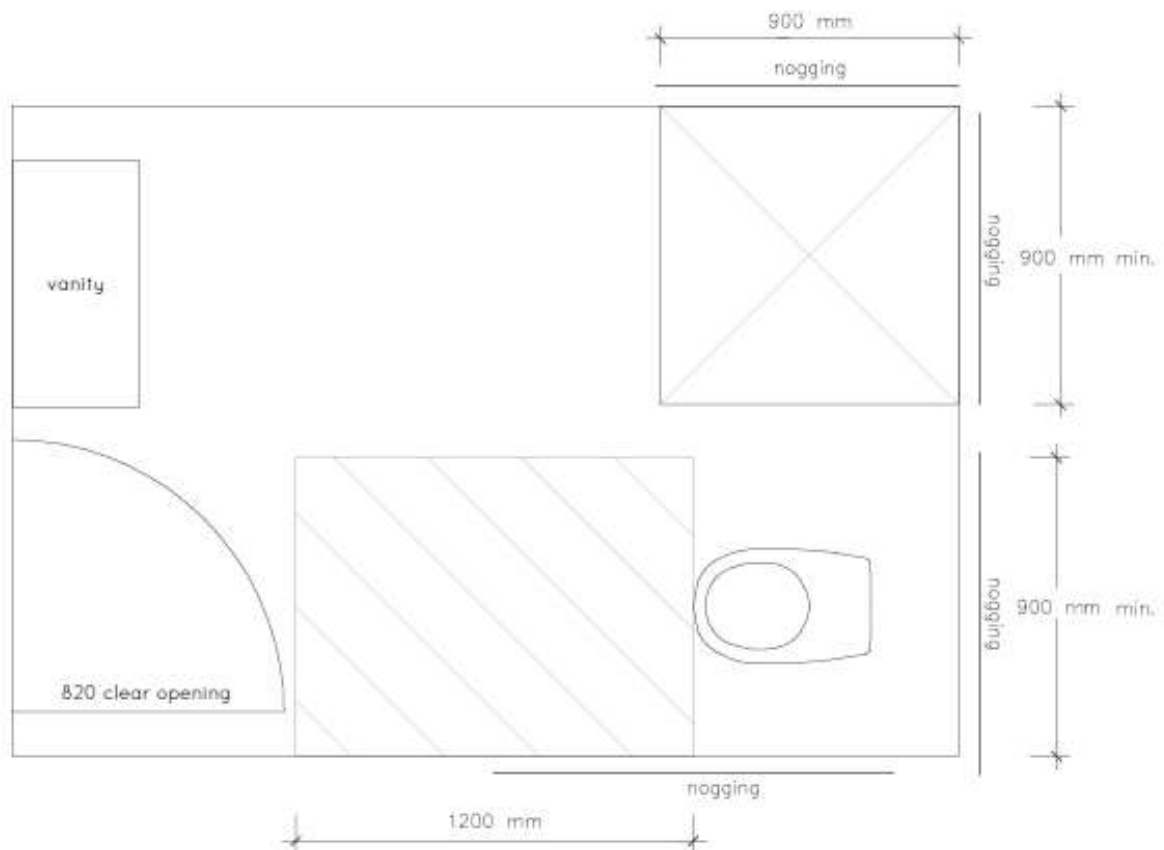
(b) Silver level ground (for entry) level toilet layout and space requirements in a combined bathroom.
